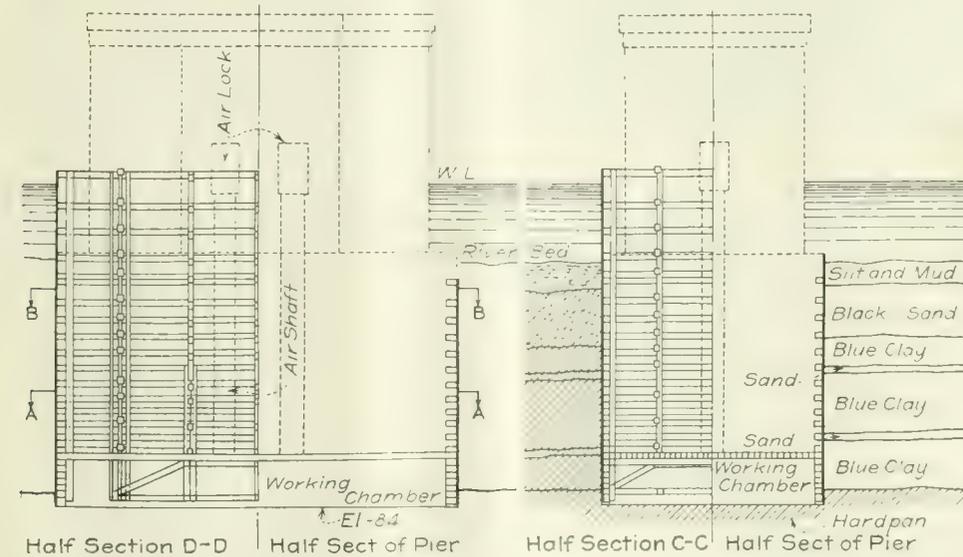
Details of Caisson Used in Constructing Pier No. 6 of Red River Bridge No. 2. Note Character of Subsoil at Site of Bridge.
